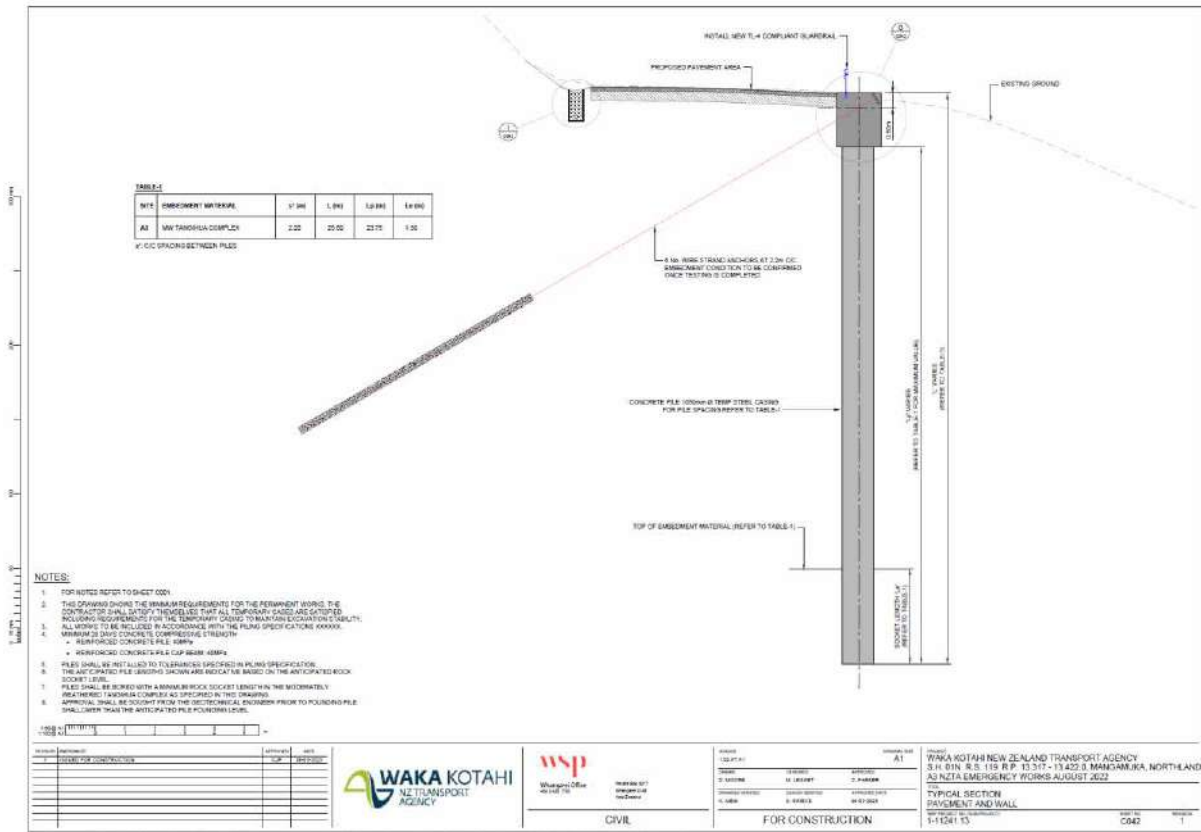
Typical cross section, concrete cap and pile retaining, channelling and pavement.
